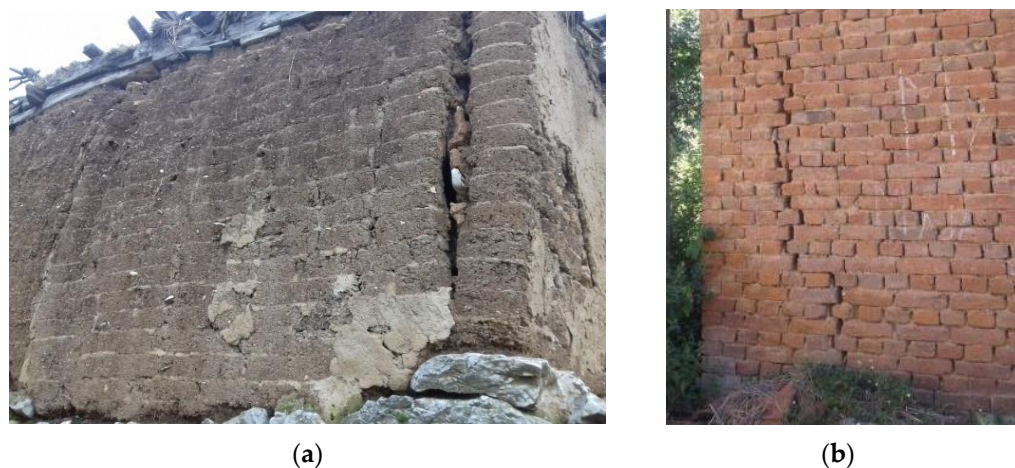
(a) Adobe wall. After soaking and then after drying, some parts of the walls became separated from each other. (b) Structural cracks (photo A. M. Petronijević).
